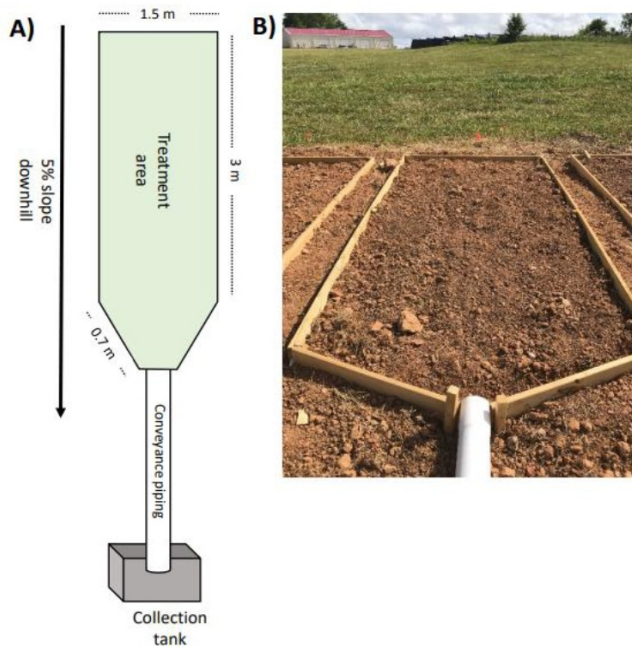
(a) Plan view of site configuration showing connection between plot areas and collection tanks, and (b) photo of the site configuration before treatment application (Kranz 2021).
